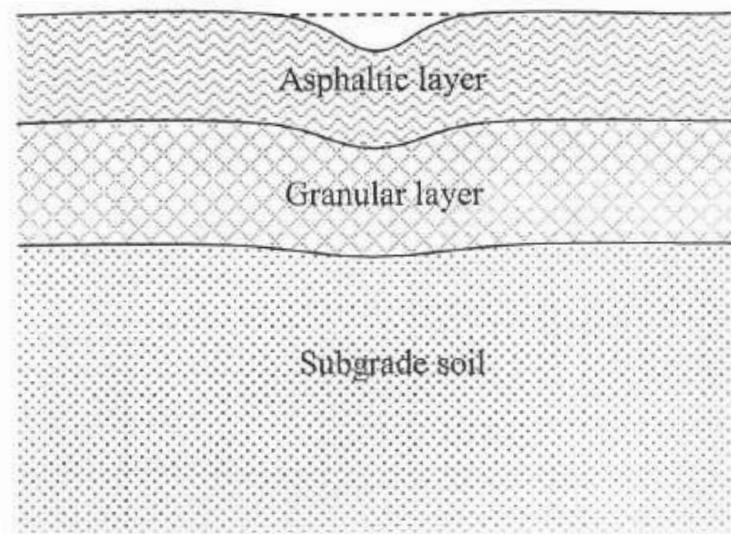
Illustration of rutting in road pavements (Wang, 2011)
